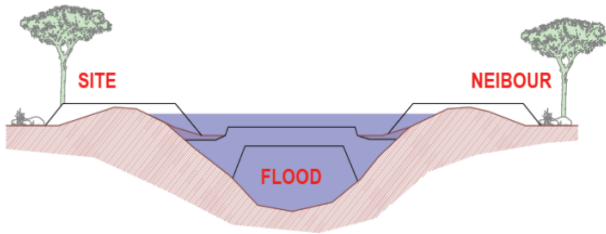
Bridge-level, Detail at A (flood impact and drainage) constraint observations Source: Field Survey, (2025)
